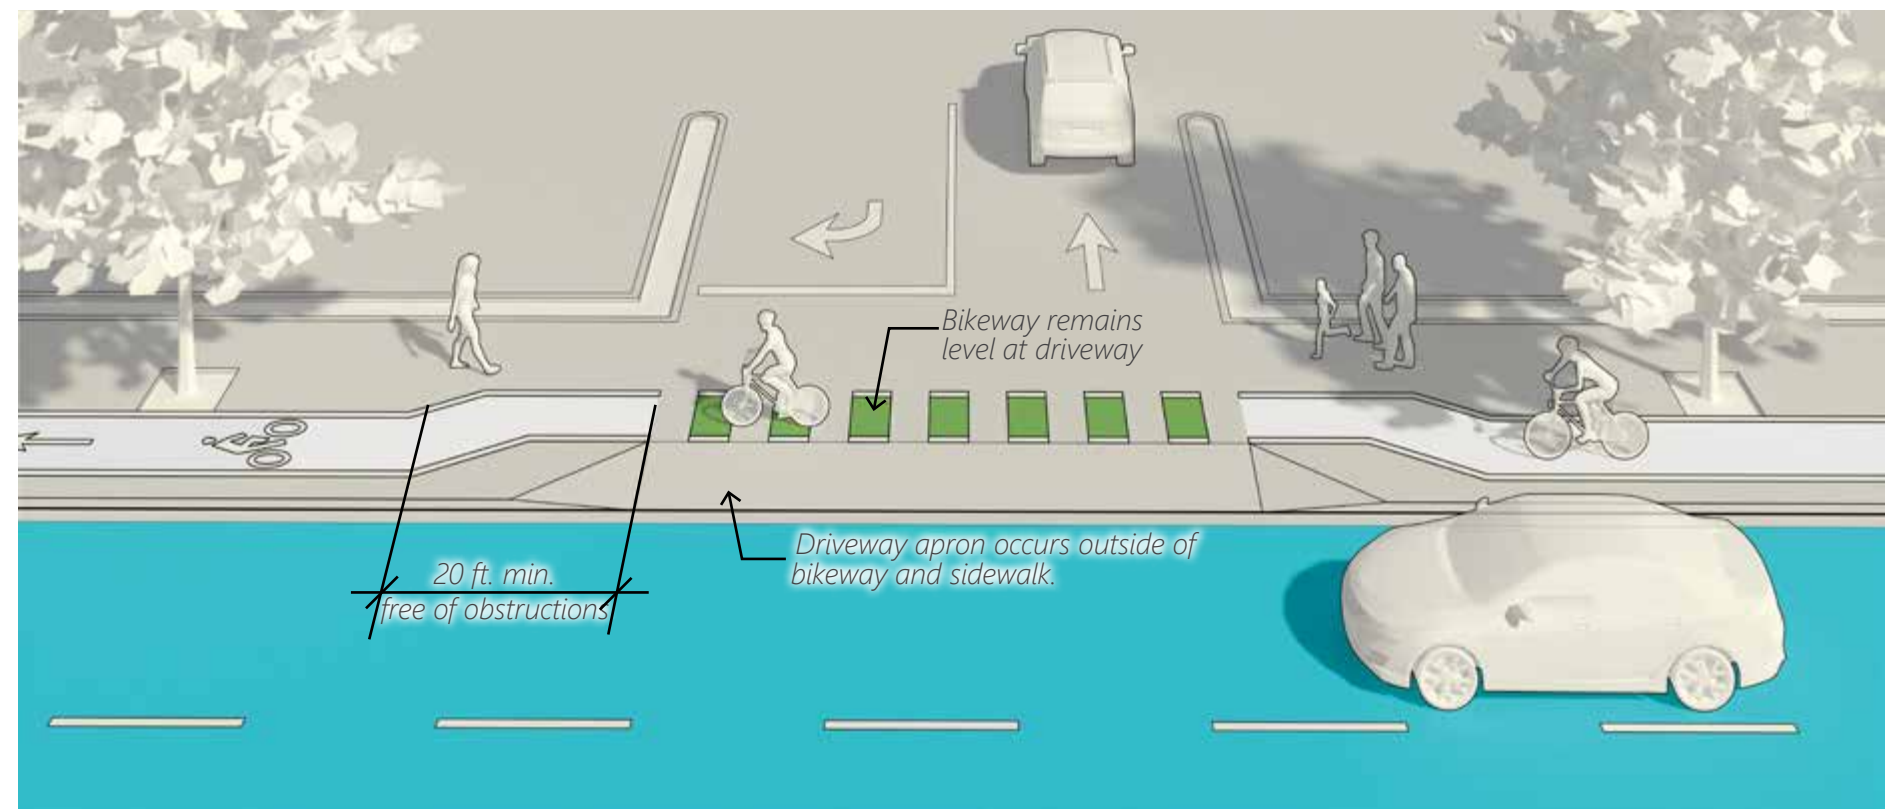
Sidewalk-Level, Class IV Bikeway at a Driveway.
